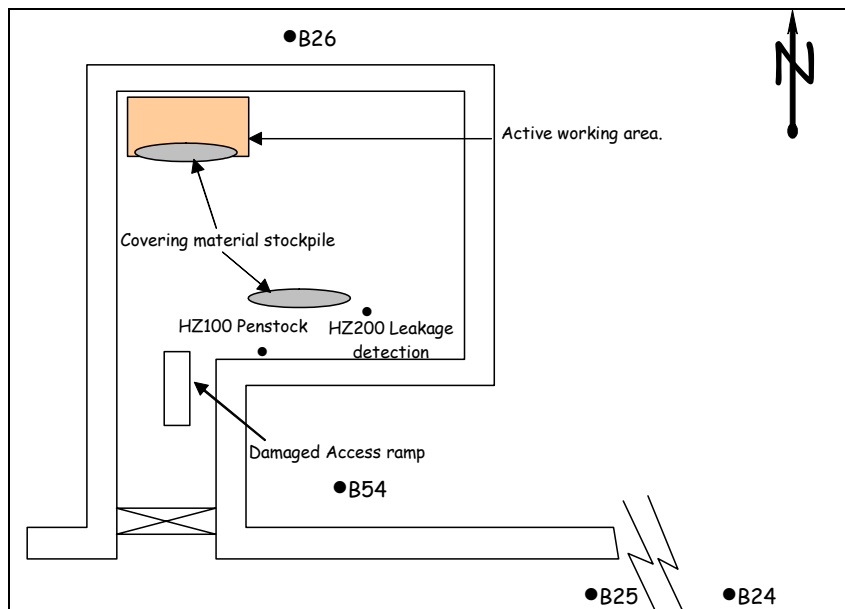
Site Plan and Monitoring Locations at Hazardous Waste Site.
